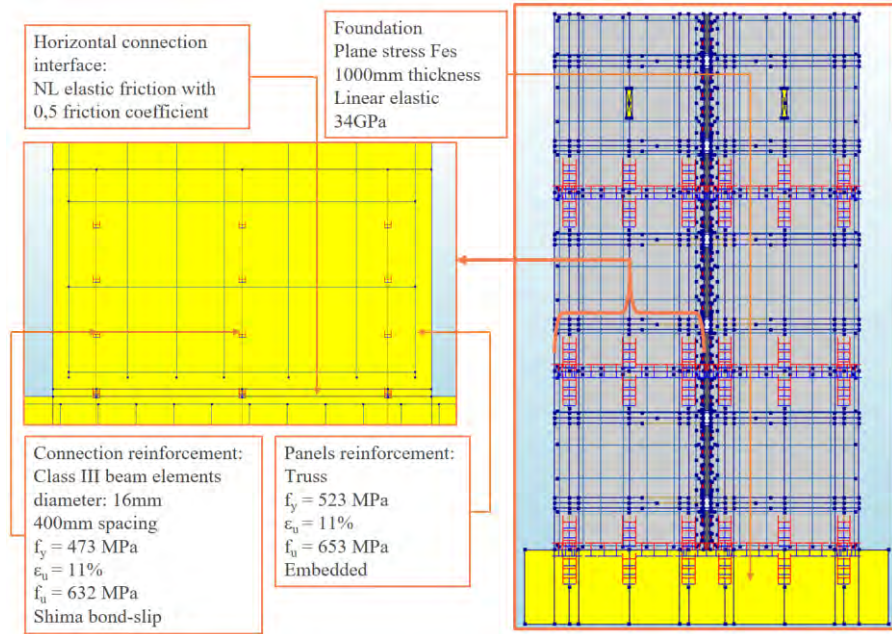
Horizontal connections modelling in the global detailed shear wall model
